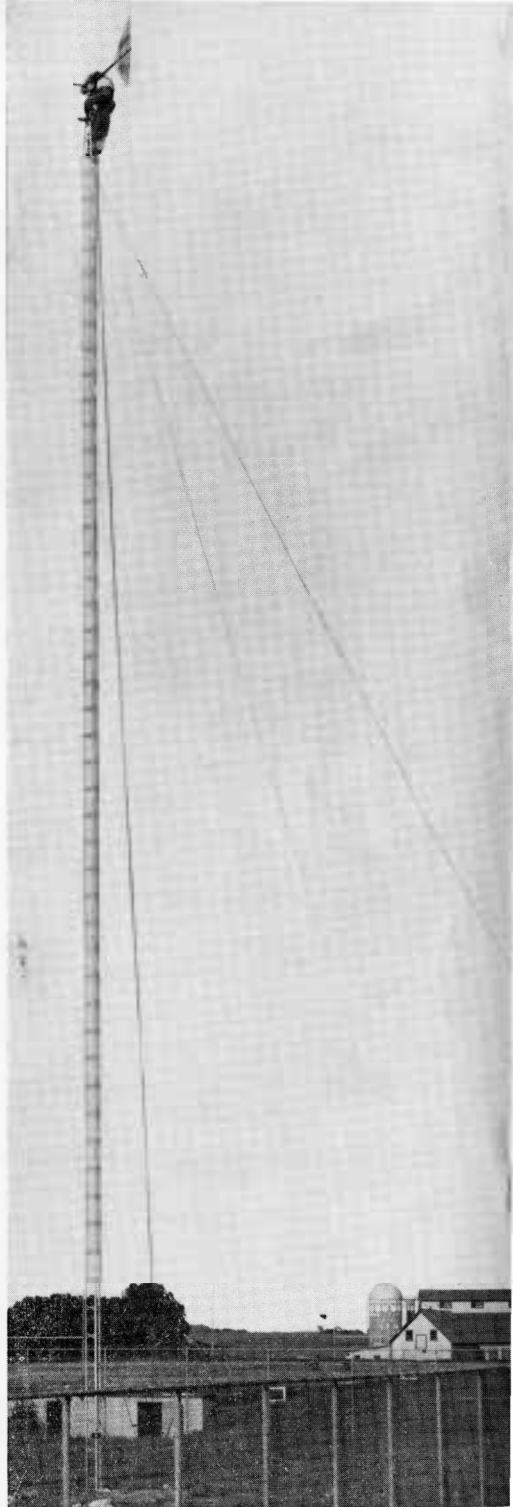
Workmen assembling the wind-electric tower and plant at Brookings, South Dakota
